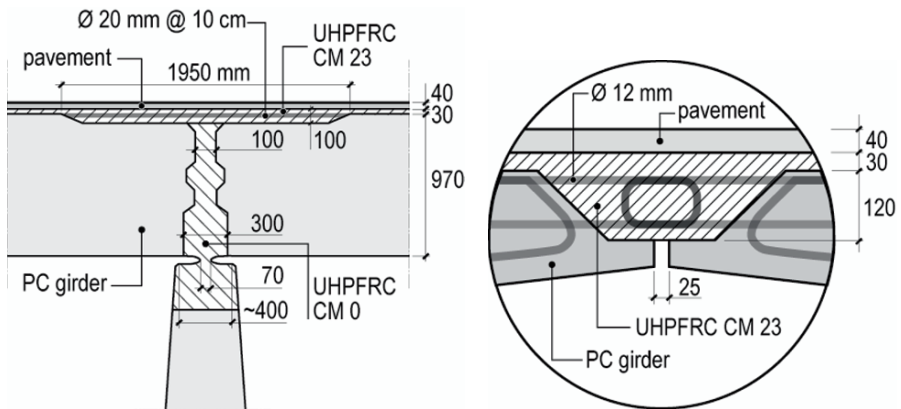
(a) Detail 1: middle support, and (b) Detail 2: longitudinal joint between prefabricated girders
